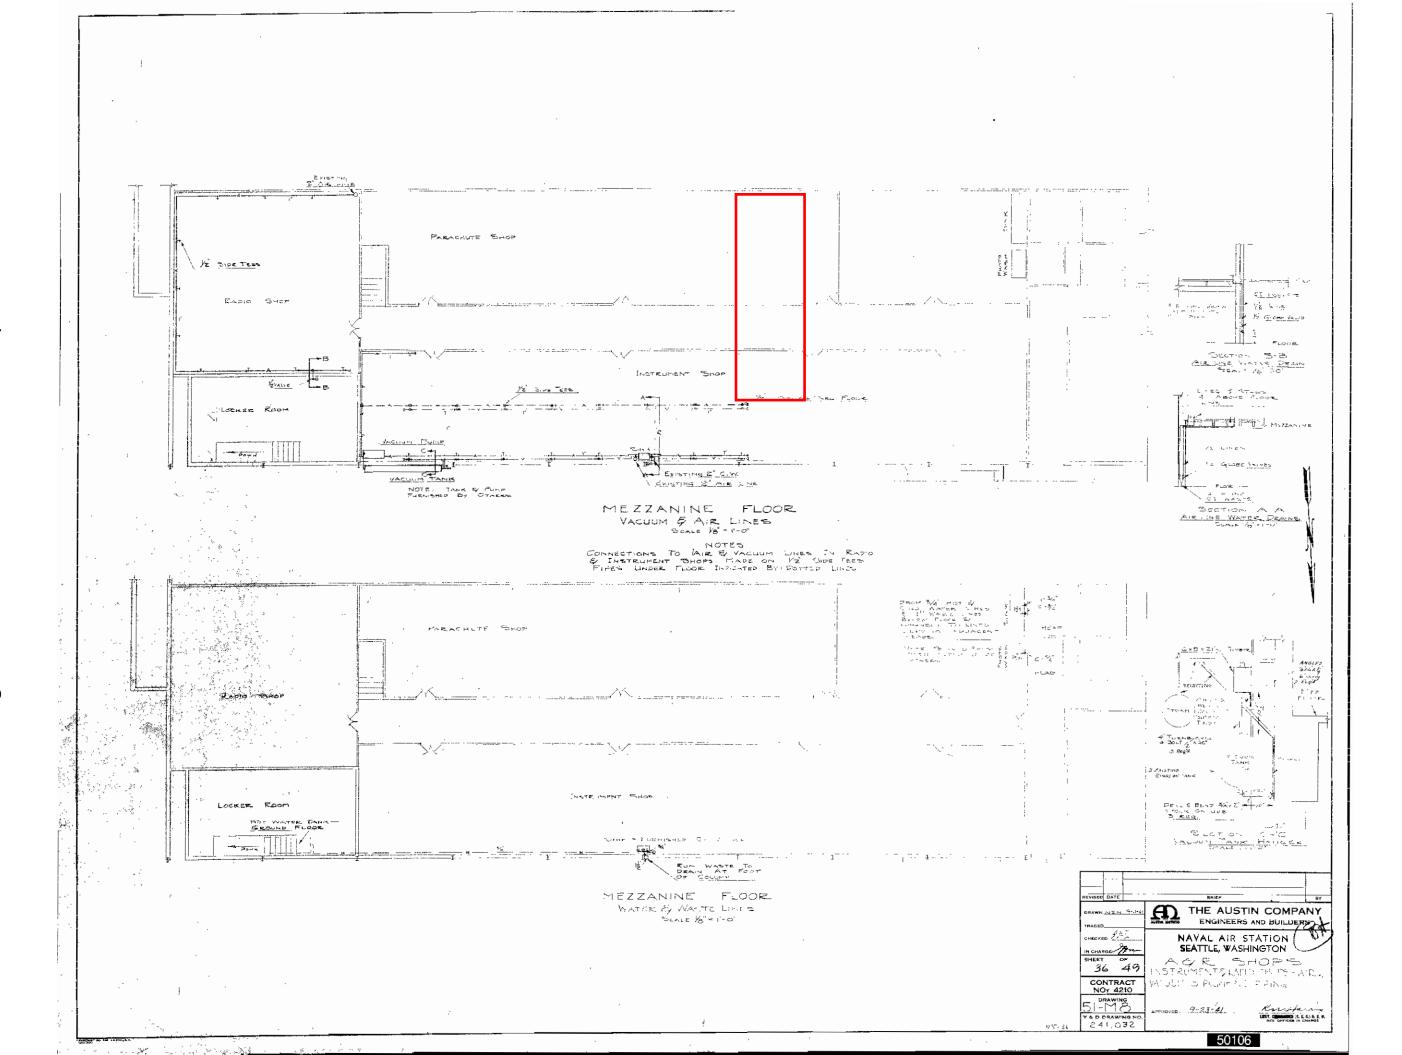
1941 Former Instrument Shop Northern Brick Wall
